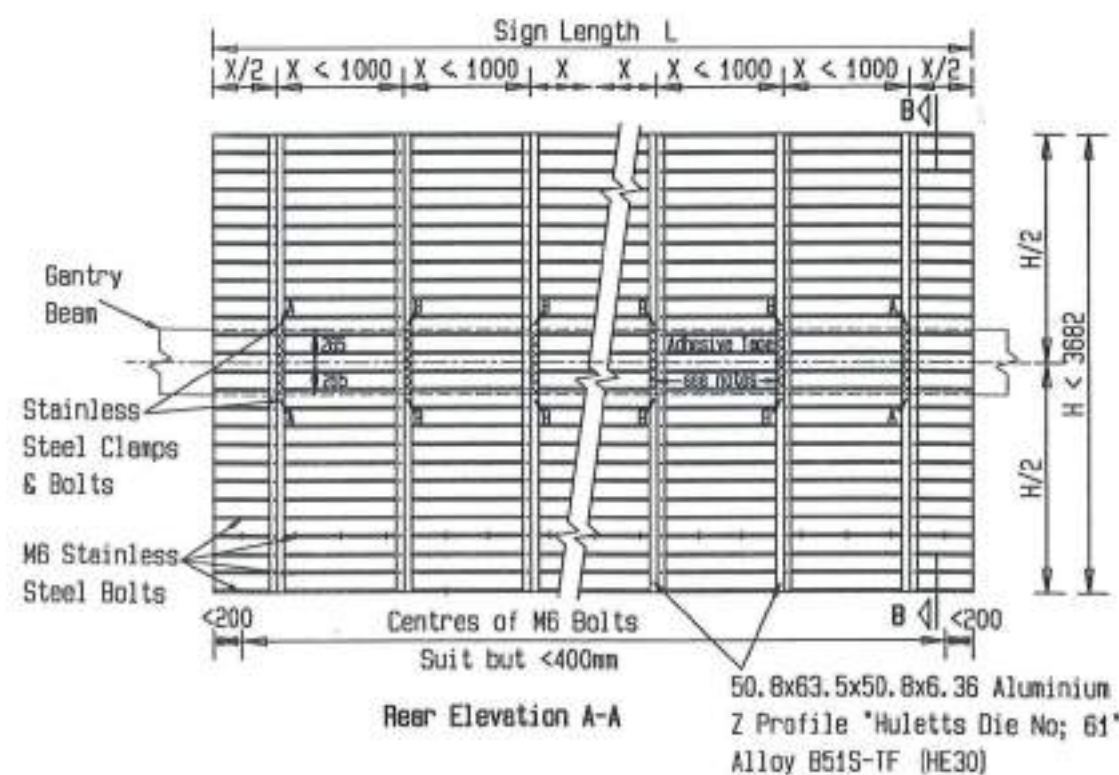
Fixing Detail for Reinforcing Profile
